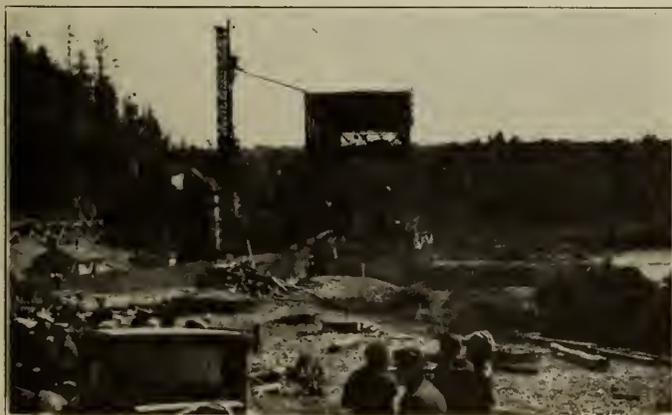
Grand Falls Power Development—Power House under Construction.
